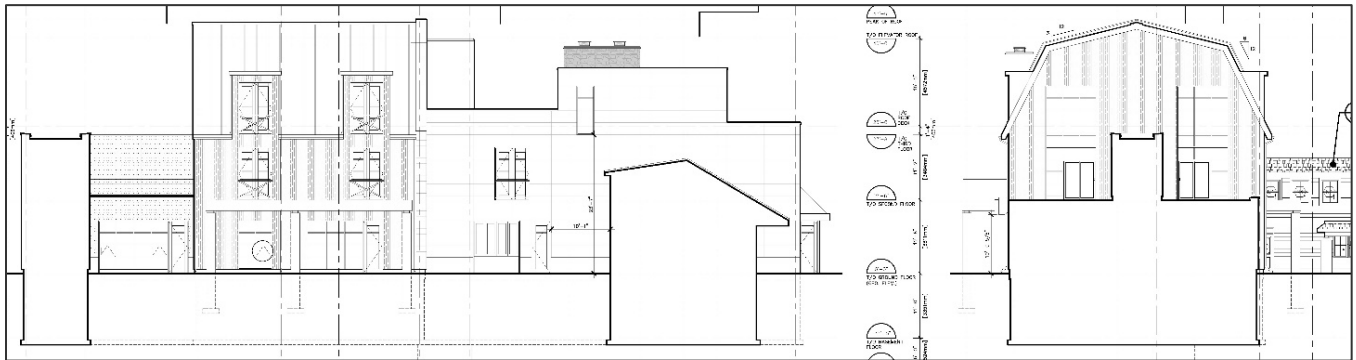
South and West Elevations, North Wing (source: Shoalts and Zaback Architects)
